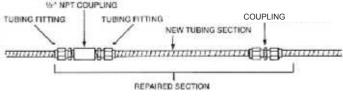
Repair of Damaged Tubing with a Spliced New Section
